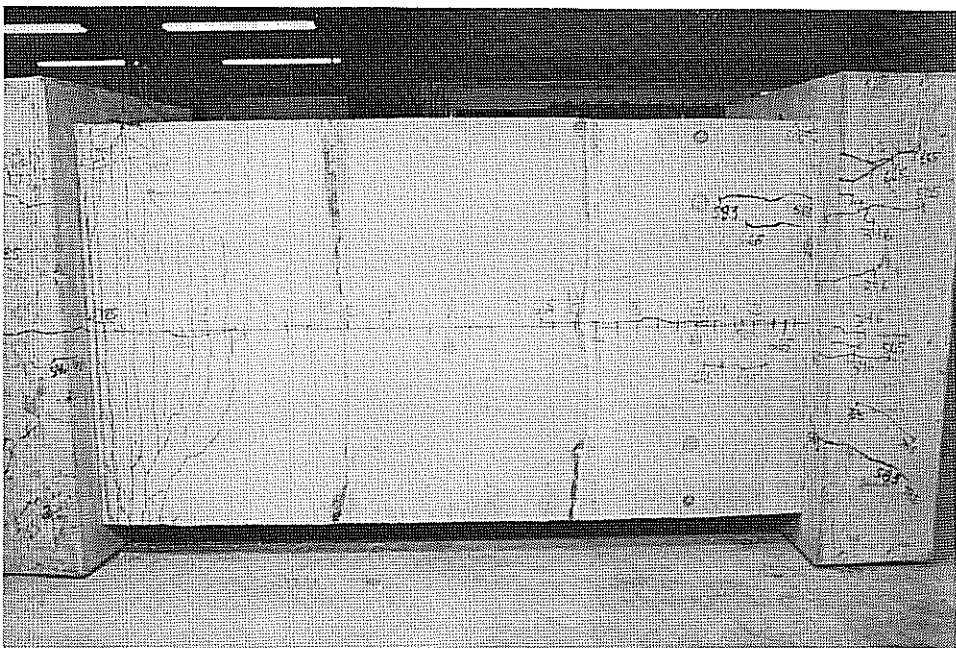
Specimen 9MLP22 "Tension" Flange
